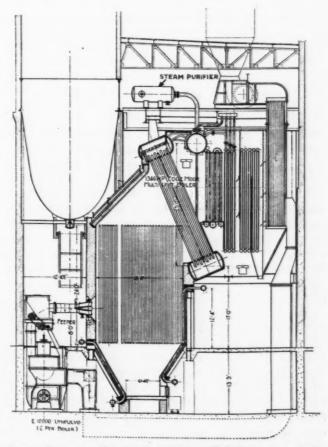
Steam purifier in connection with high pressure boiler in a paper mill.
